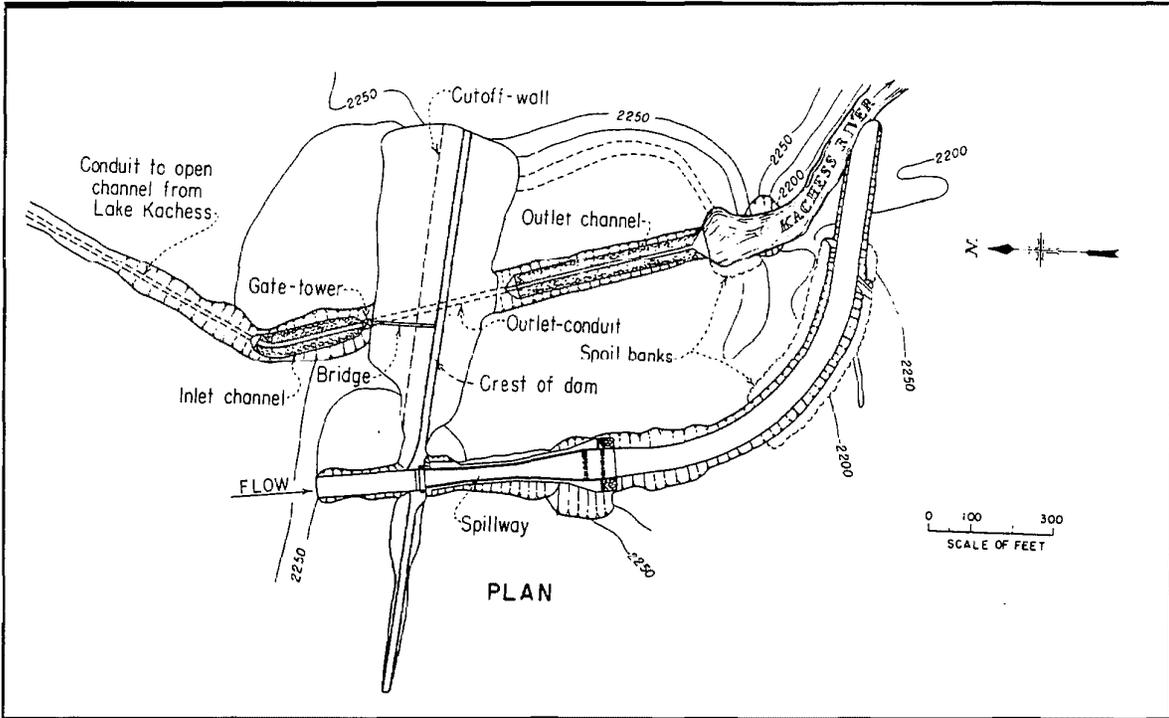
Plan of outlet system of Kachess Dam and Lake prior to 1996 cleaning and enlargement of the in-lake open channel and closure of the in-lake “conduit” (pipeline).
